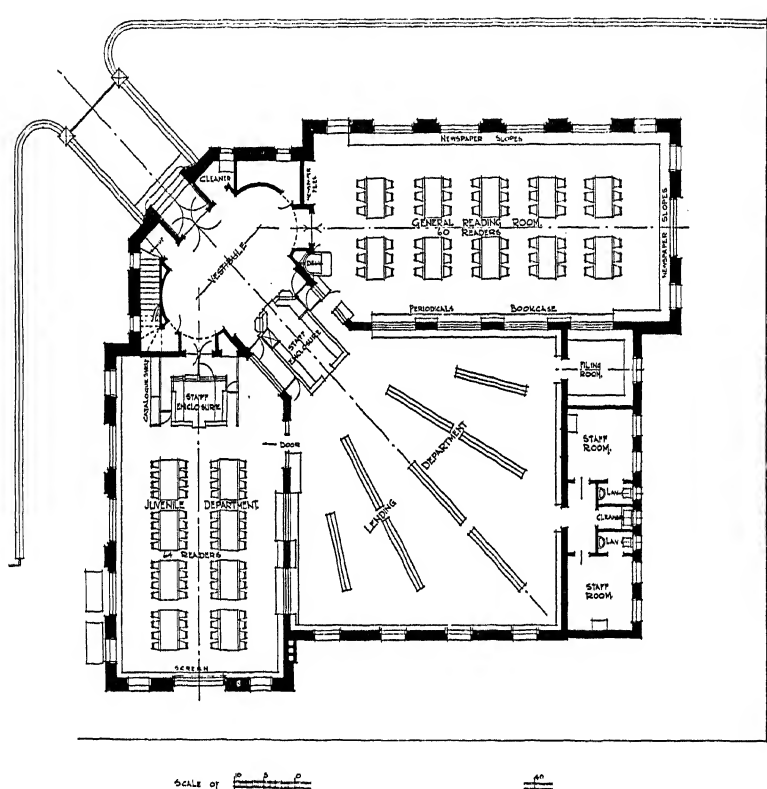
Whiteinch Branch Library, Glasgow. Ground Floor Plan (Section 177).
